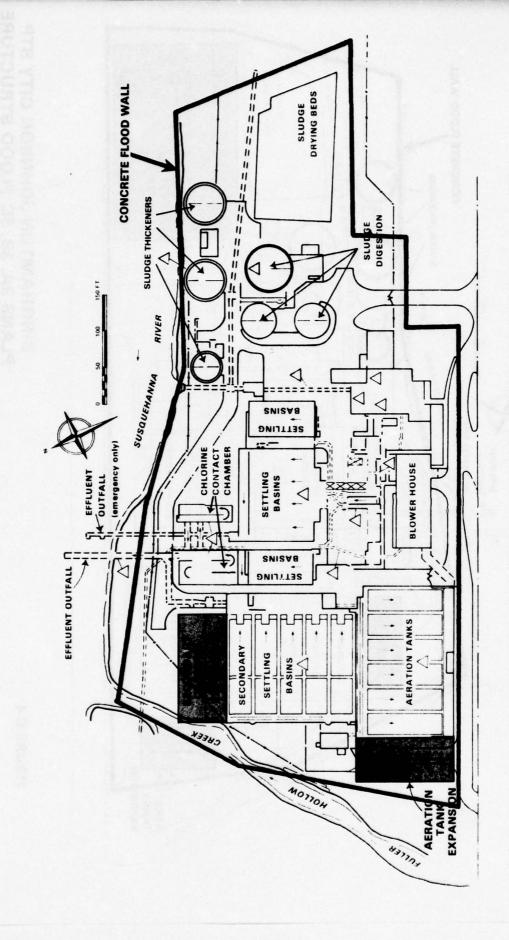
BINGHAMTON-JOHNSON CITY STP CONCRETE ELL WALL SECTION
